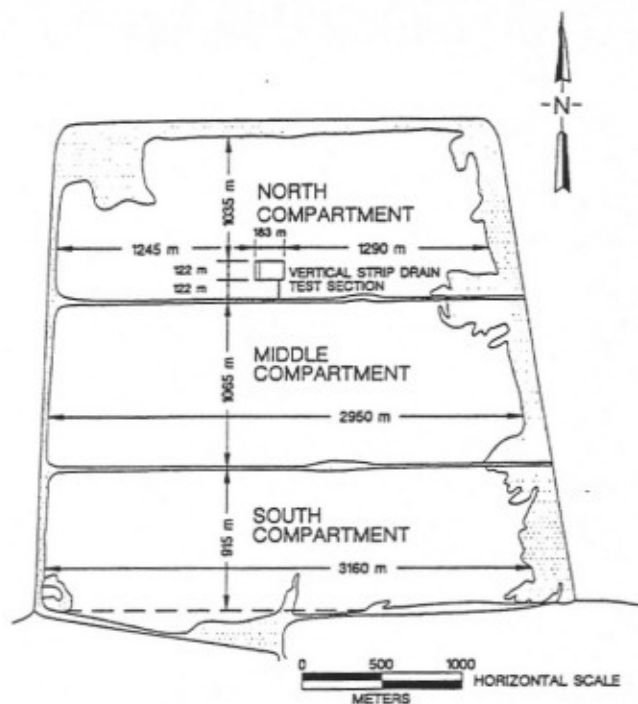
Plan View of Craney Island and Location of Vertical-Drain Test Section
